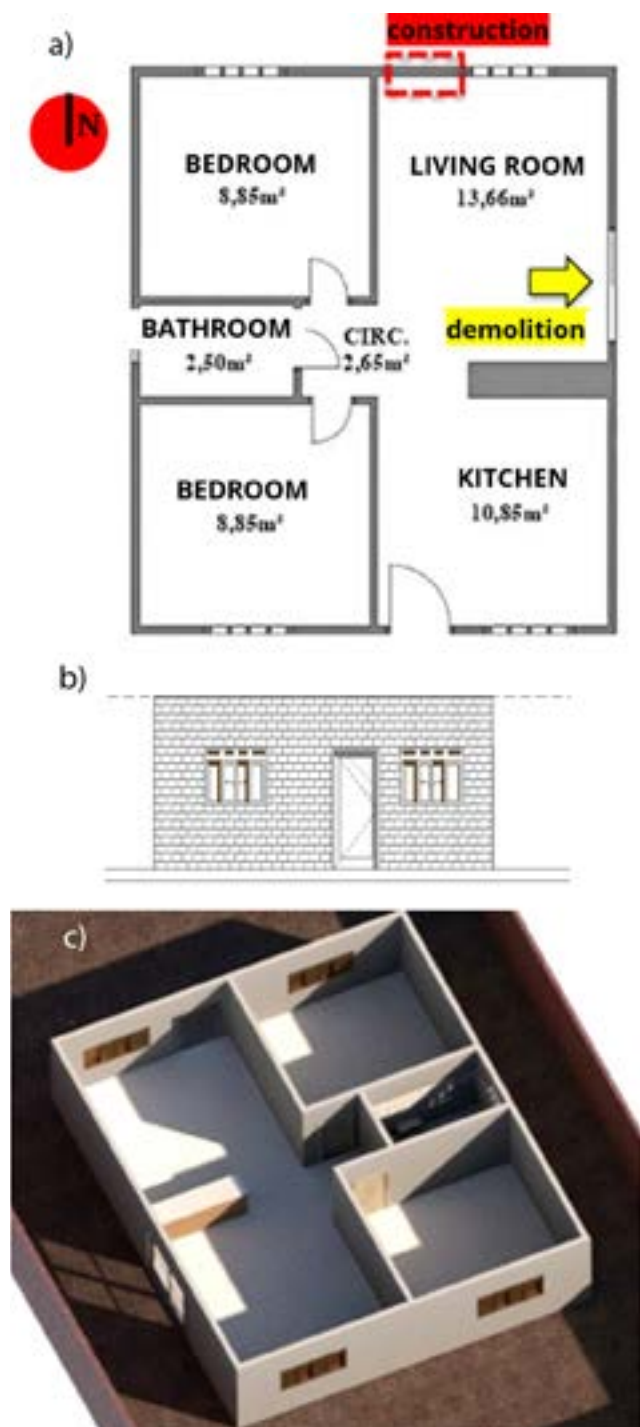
Housing project: (a) Floor plan adapted according to the modifications of new openings made by the resident. In the original plan, the main access was 0.60 m, as delimited with a dashed red marking, being replaced by larger spans, highlighted with a yellow arrow; (b) Elevation; (c) Interior top view. Source: Authors.
